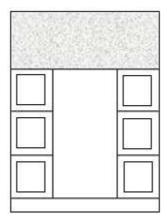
Complete Hybrid Concrete-FRP Bridge Section
